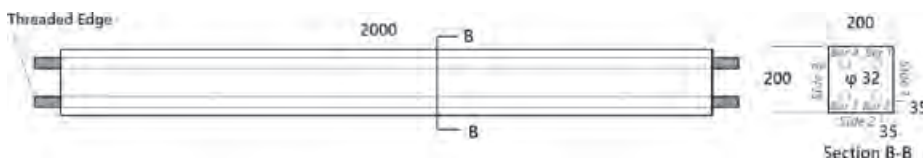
Details of the axial tensile specimen (all dimensions are in mm)
